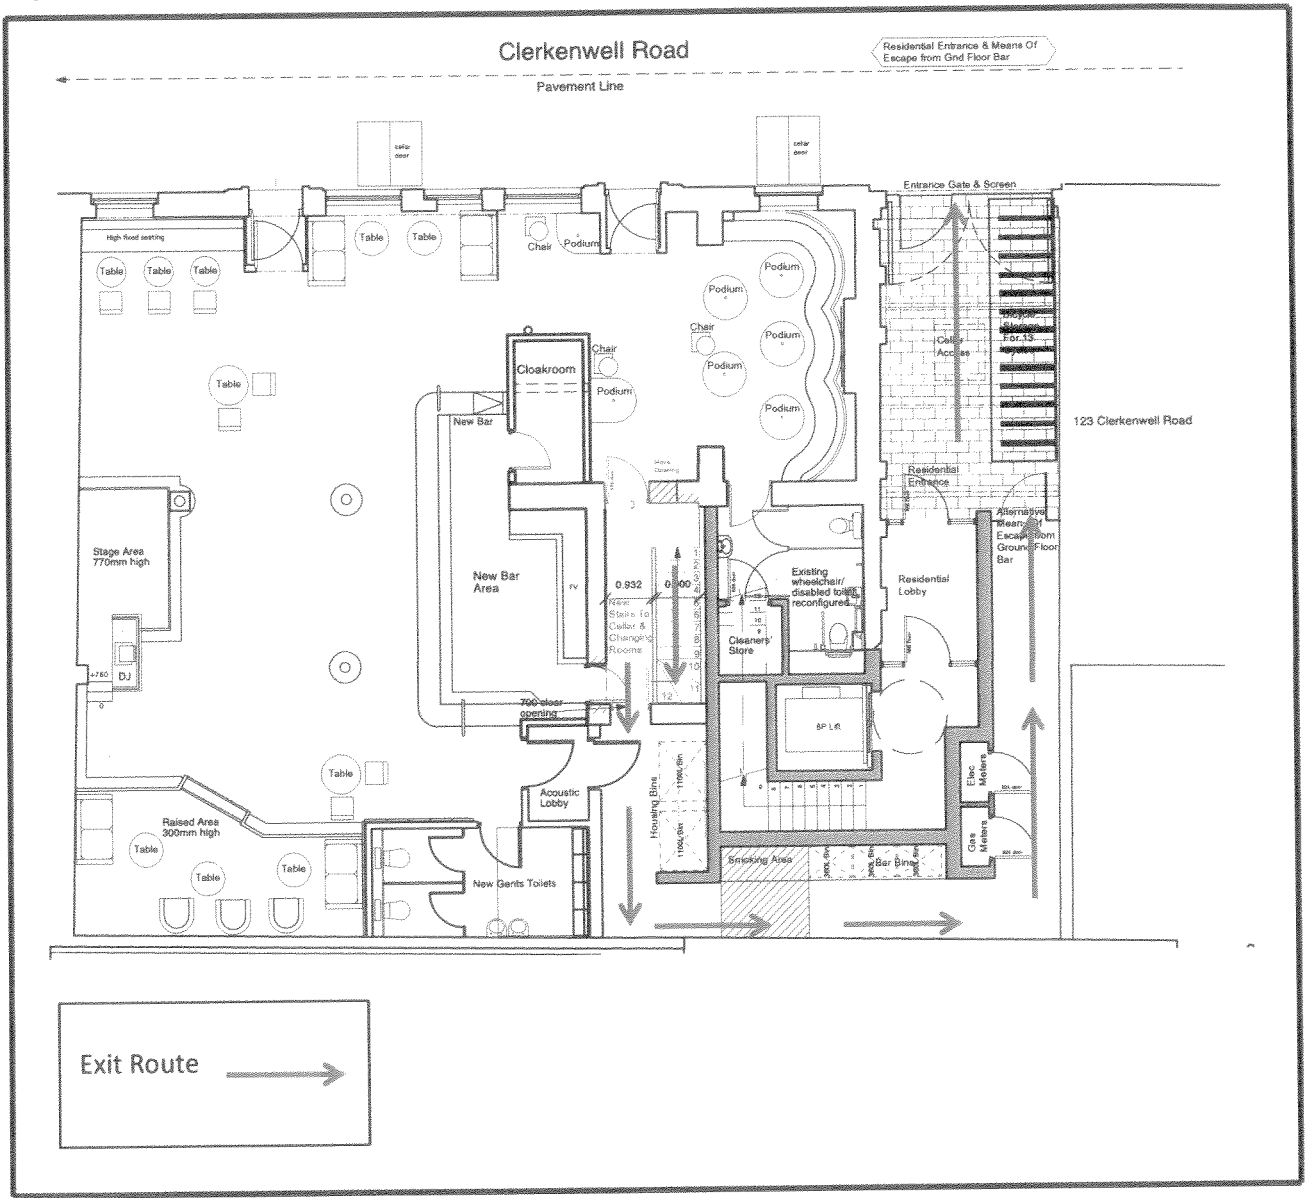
Proposed Female Changing Room Exit Route (Ground Floor)
